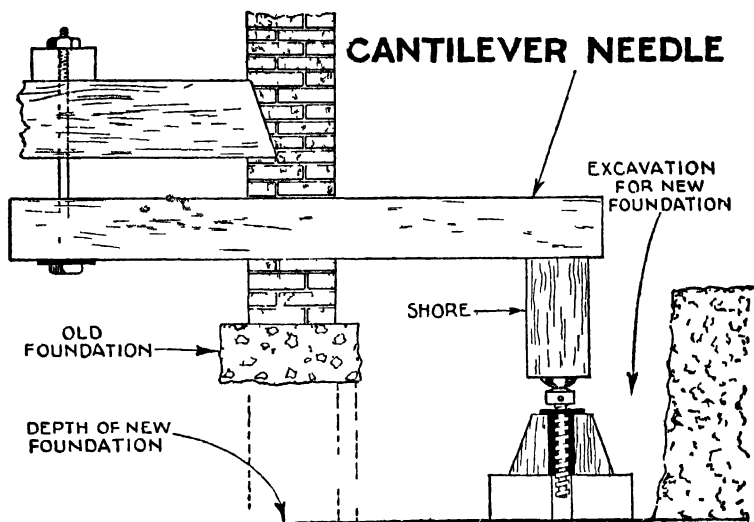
611 —Cantilever needle method of under pinning old building for the erection of new foundation or pier reinforcement to old foundation
